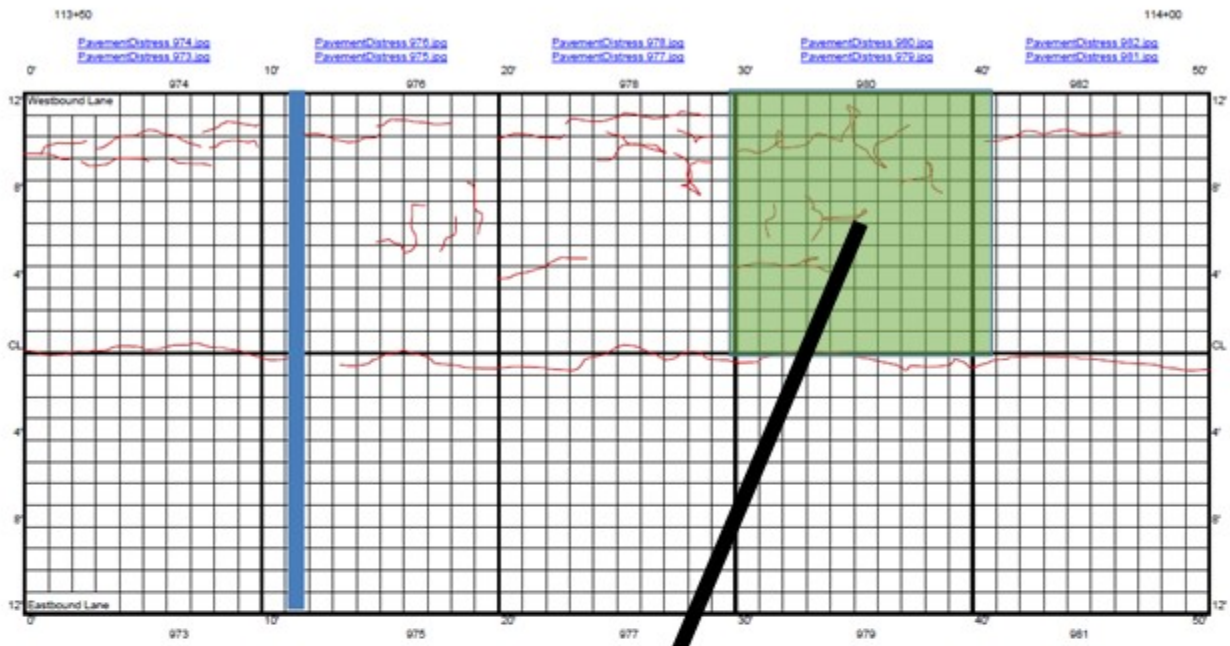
Fatigue Cracking in Section 1A
